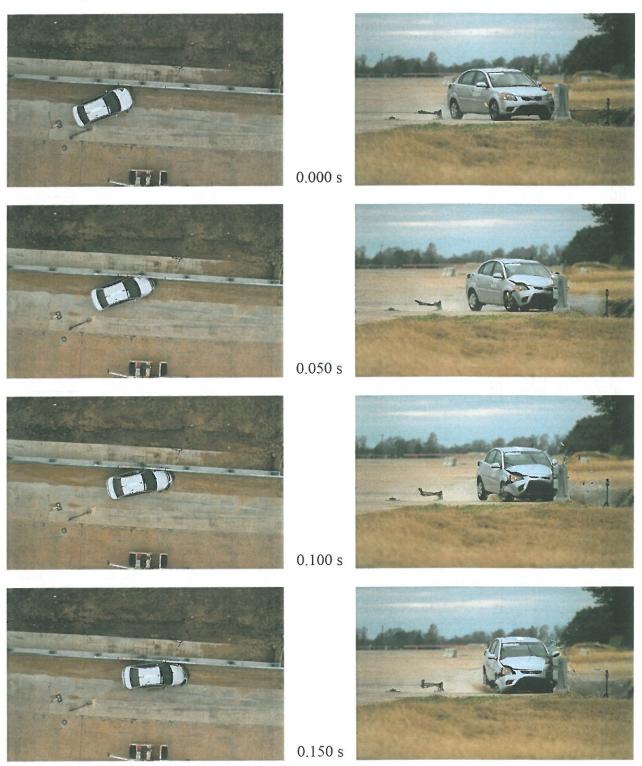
Sequential Photographs for Test No. 608331-01-3 (Overhead and Frontal Views).
